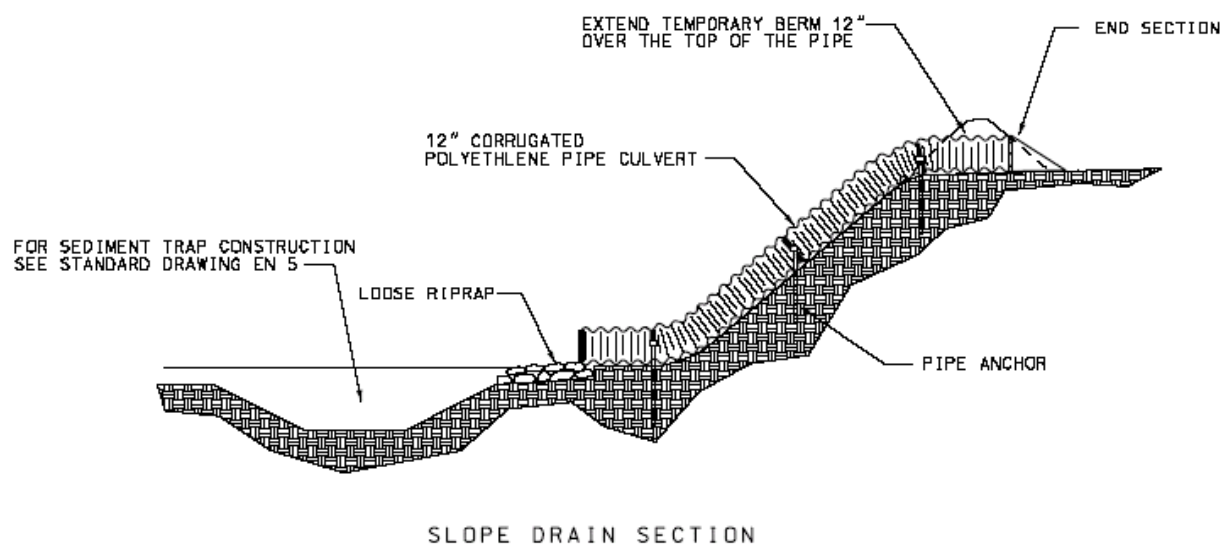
Cross Section of Temporary Slope Drain
